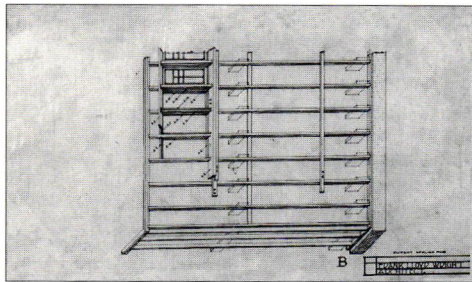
ASBH standardized balloon frame detail: windows and framing.
